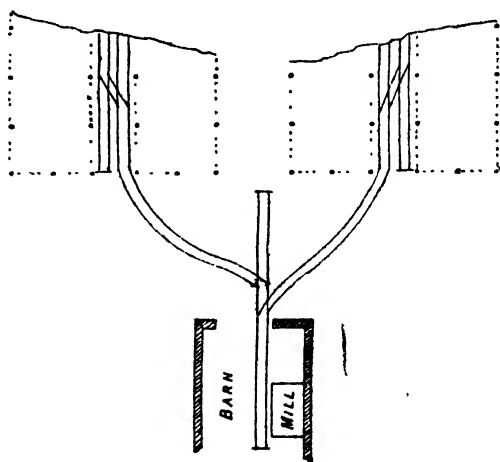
Plan of increased shedding to be worked on the trolley system.
